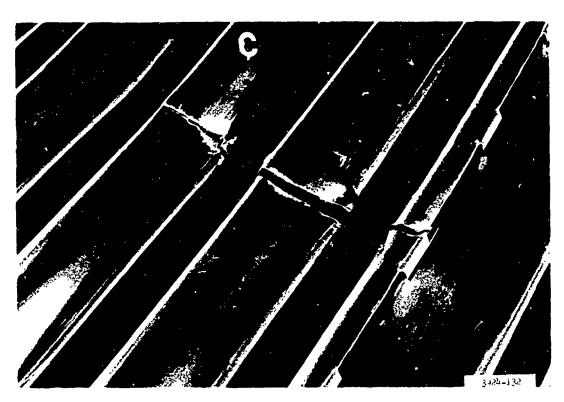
Test section I, lane 1, item 3, prior to traffic
